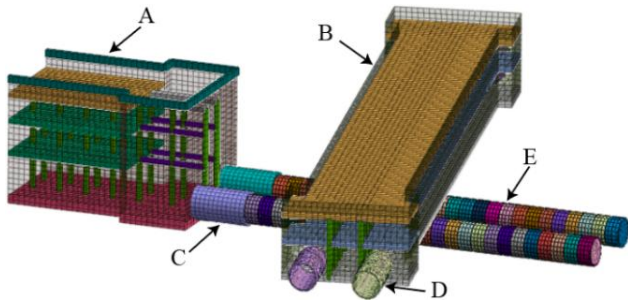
Major structures: A–new Line 12 subway station; B–existing Line 1 subway station; C–horizontal freezing reinforcement treatment; D–existing Line 1 shield tunnel; E–new Line 12 shield tunnel
